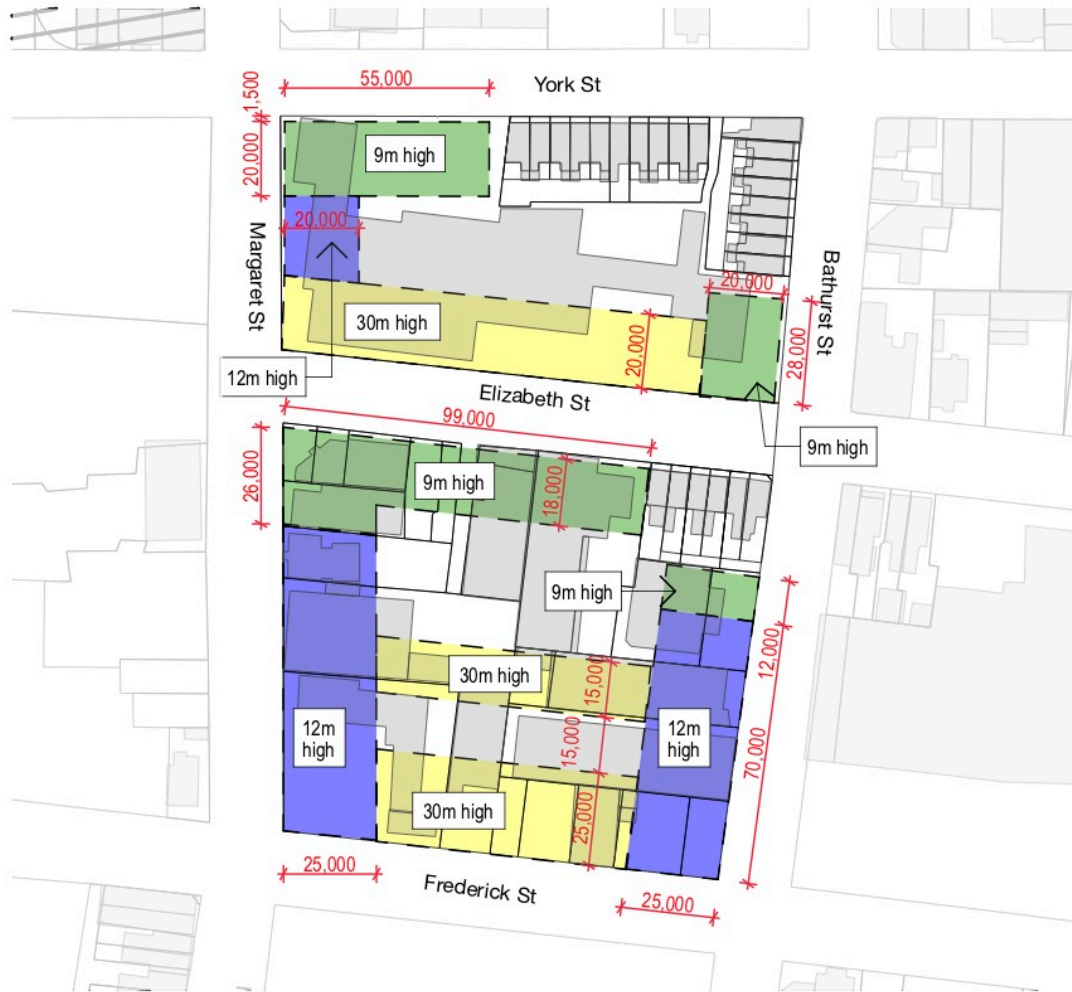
SITE A1 - Option 2 - Site Plan Margaret, York, Bathurst, Elizabeth and Frederick Street Blocks.
